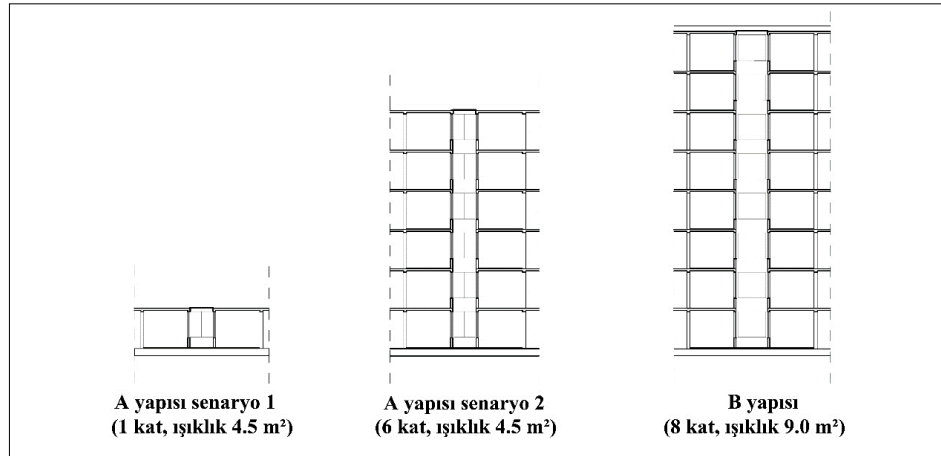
The sections of building A and building B (A binası ve B binasının bölümleri)
